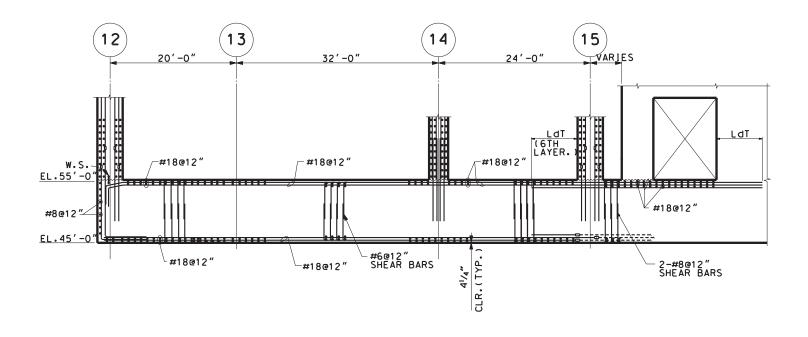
A-37 Typical Reinforcement of the AB Basemat (Section A)
